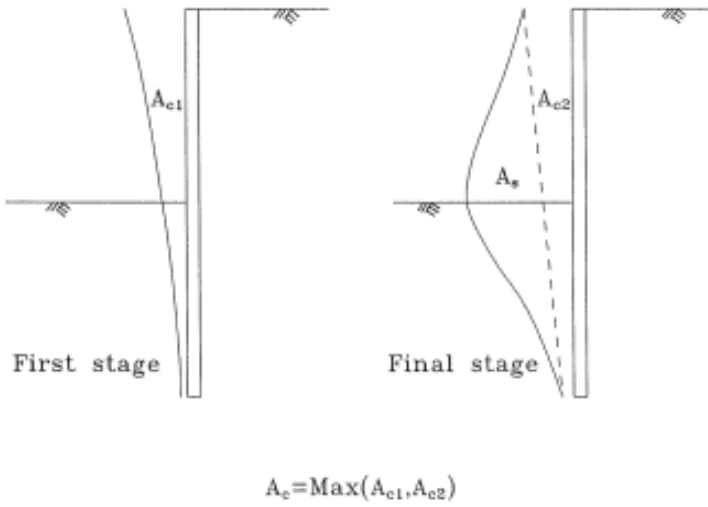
Deformed shape of excavation supporting walls(after Ou and Hsieh, 1998)
